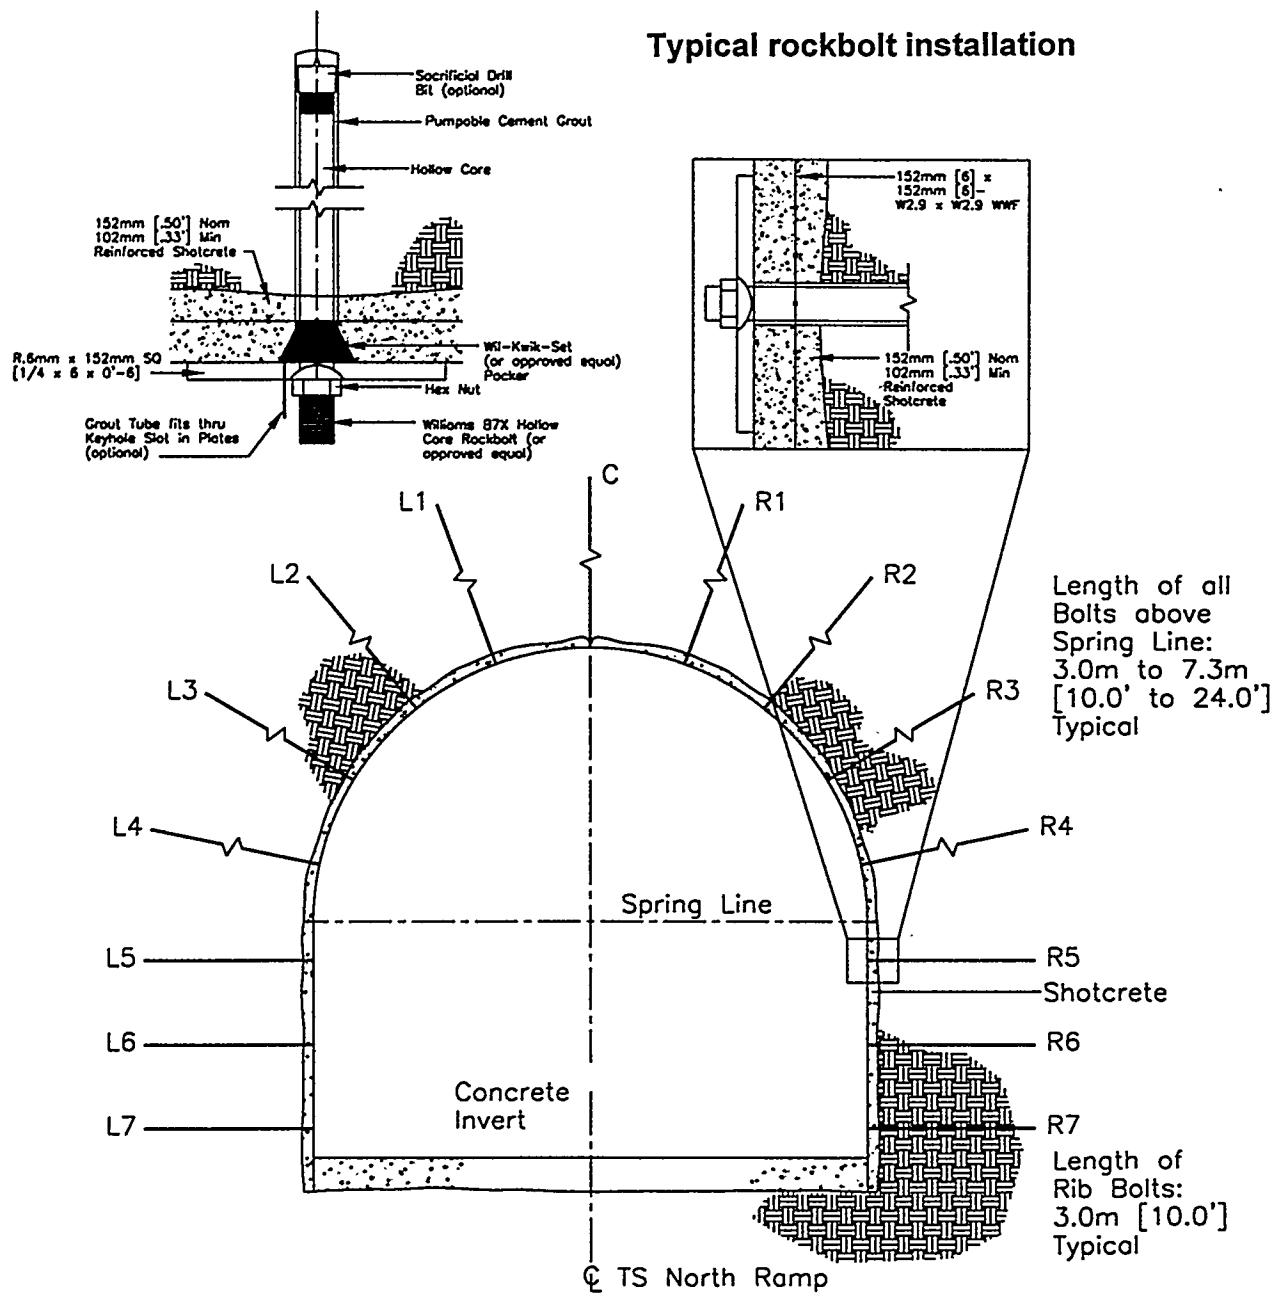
General cross section of the NRST showing pattern of grouted rockbolts installed for final support (from ESF Package 1A, YMP-025-1-MING-MG143, Rev 3).
